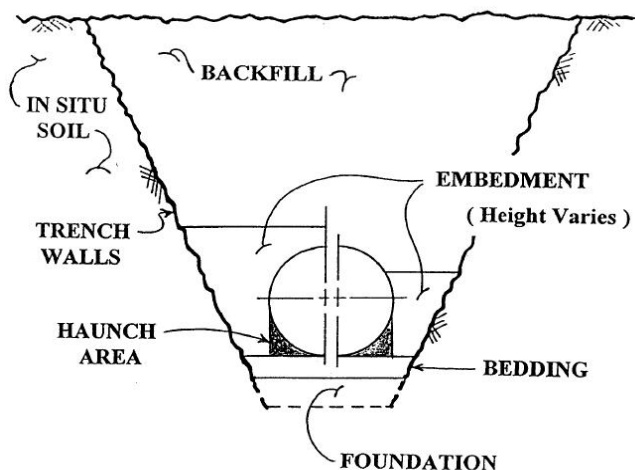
Open-Cut Pipe Installation Cross Section (Howard, 2002)
